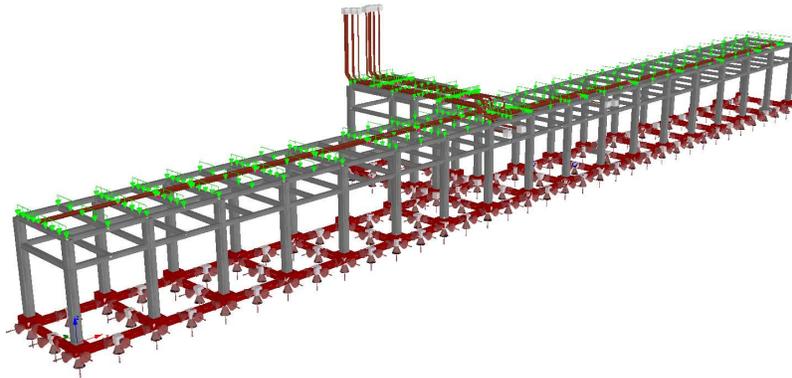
the mathematical model of soil-foundation, pipe rack and pipelines
